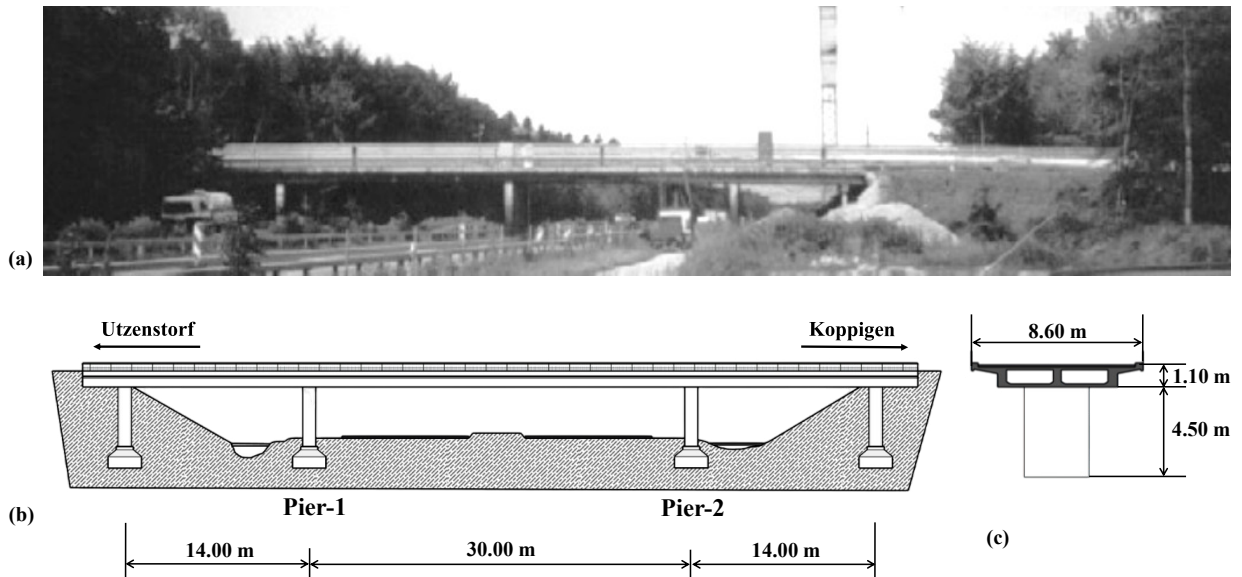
(a) Archive picture of the Z24 bridge, after Maeck and De Roeck, 2003; (b) bridge's longitudinal view and (c) cross section.
